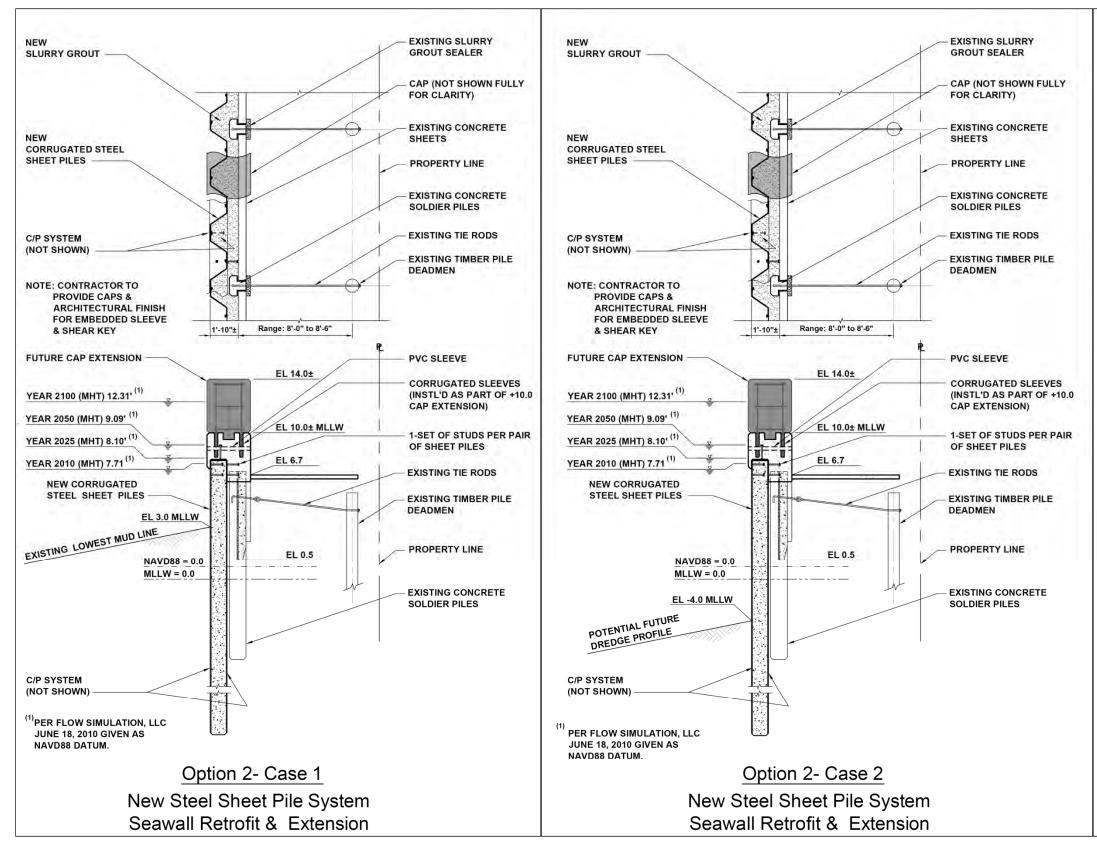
New Steel Sheet Pile System Seawall Retrofit and Extension
